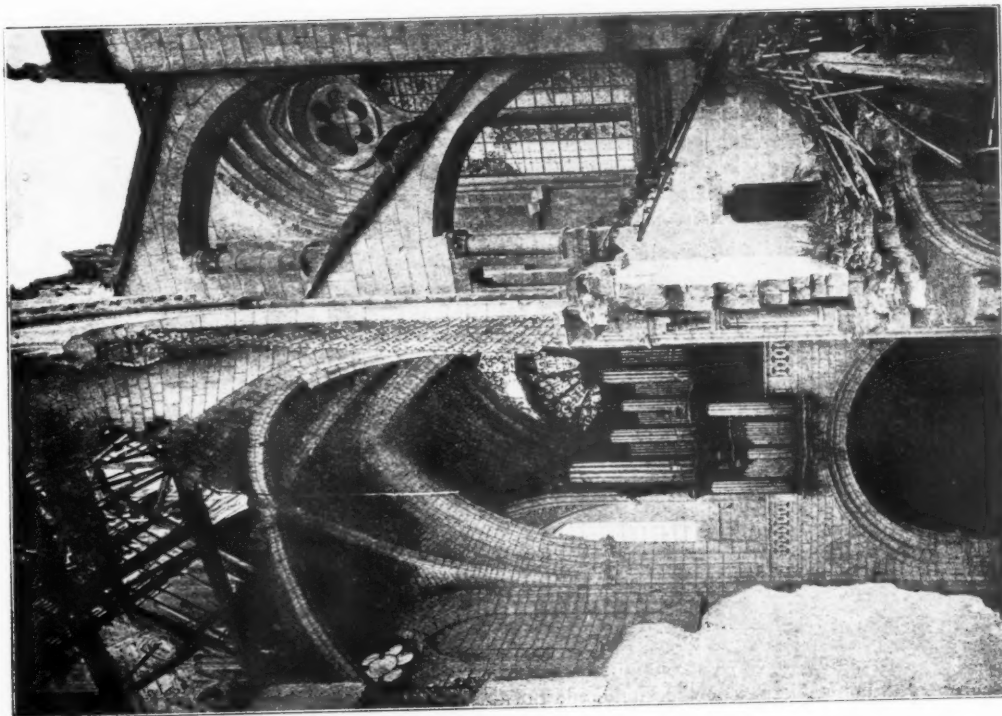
Ruined Clerestory, from Roof of North Aisle.
